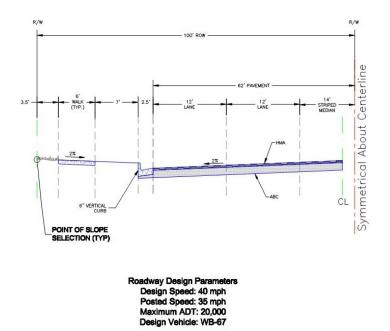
Urban Minor Arterial Roadway Standard Cross Section
